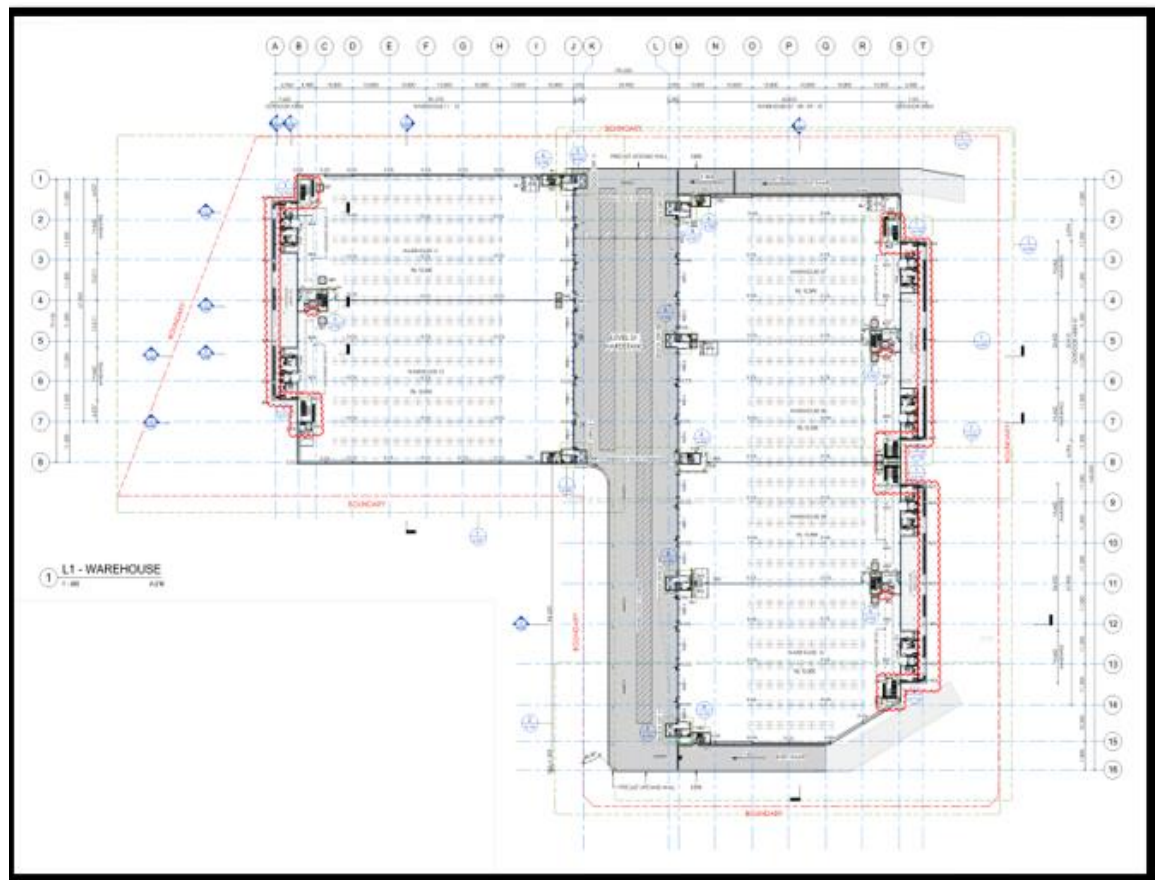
Proposed Development (First Level) (Reference: PACE Architects – Level 1 Plan – drawing 23408-A-206)
